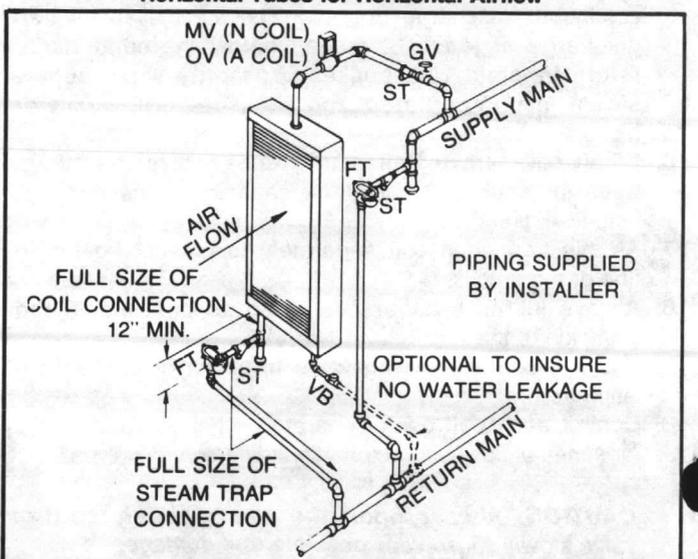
Typical Piping for Type A or N Steam Coils, Vertical Tubes for Horizontal Airflow
